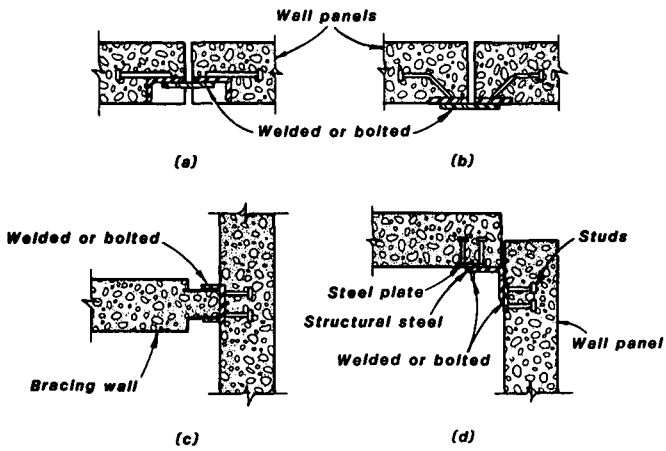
A Range of Dry Vertical Joints for Prefabricated Wall Panels.
